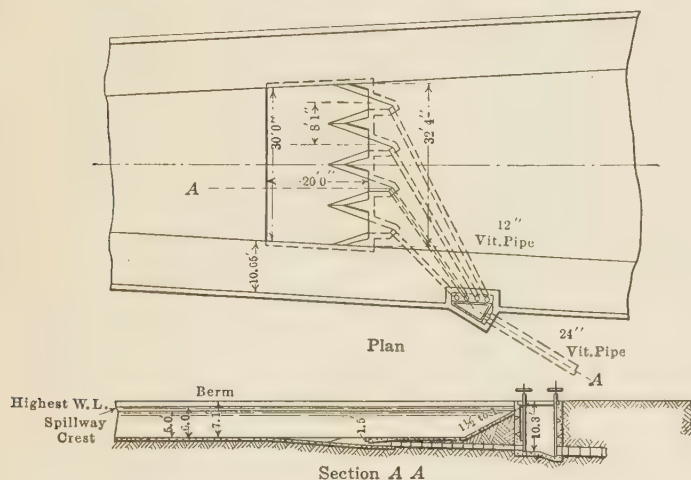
Sand trap. Naches Power Canal, Wash.
